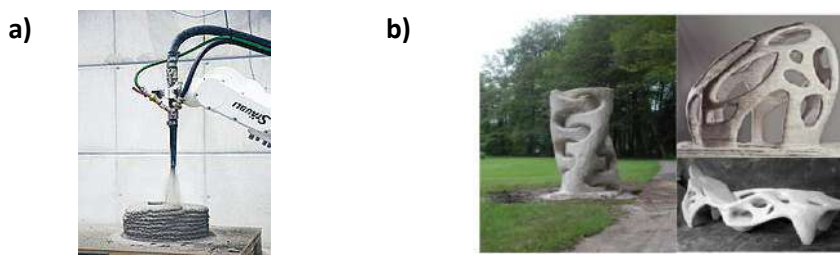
a) 3D printing technology with concrete spraying (SC3DP) - example of a concrete column [8], b) D-Shape technology - example of concrete sculptures. [9]
